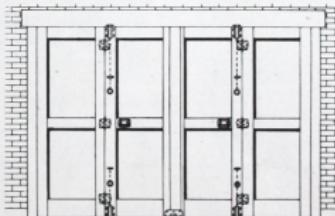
Elevation showing hardware inside the doorway when "Slidelite" No. 435 four-door equipment is applied to doors opening out.
